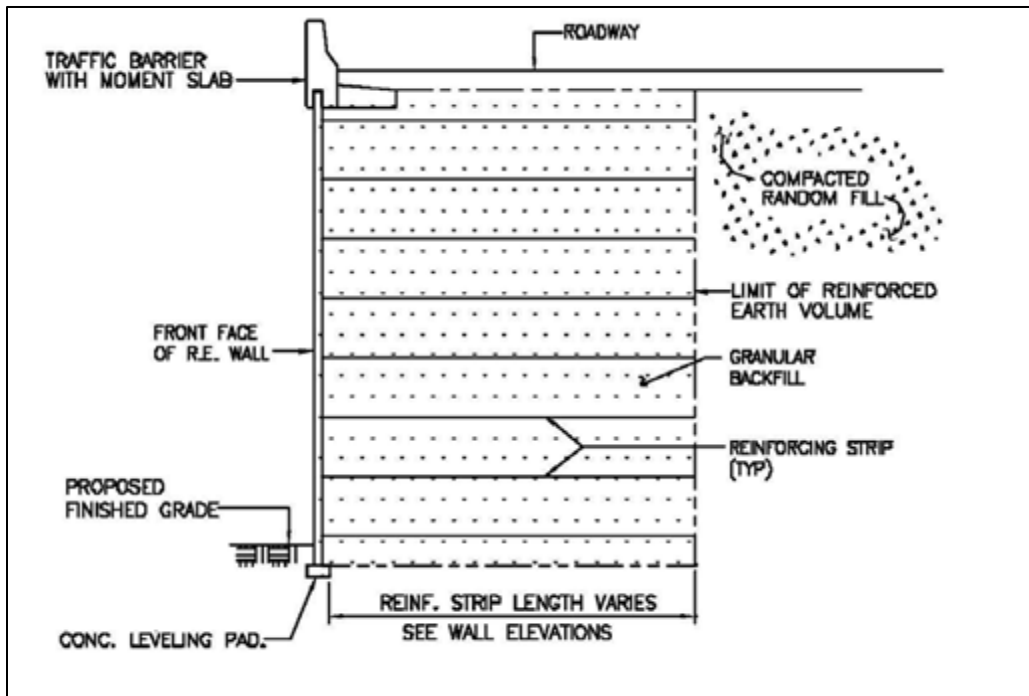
Typical MSE Wall Details ([www.fhwa.dot.gov](http://www.fhwa.dot.gov))
